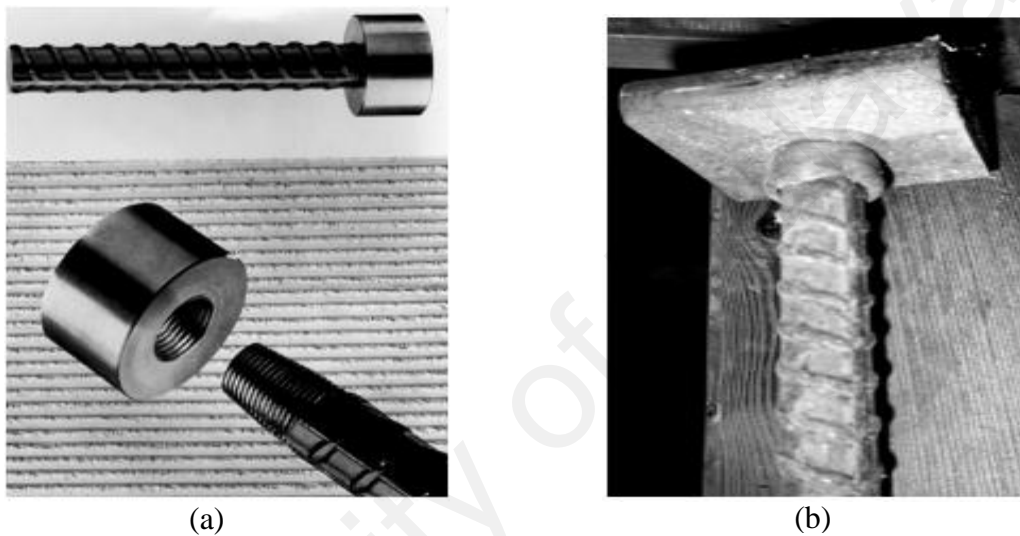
Types of headed reinforcement used in beam-column joints (Wallace, 1997) and (Wallace et al., 1998)
